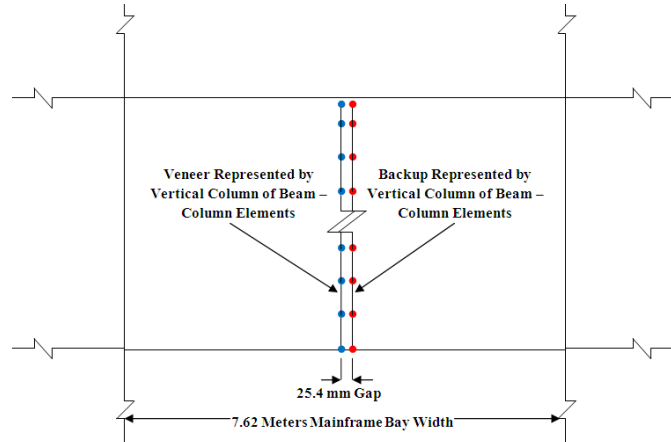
Veneer and Backup Elements in CMU Backed Wall System
